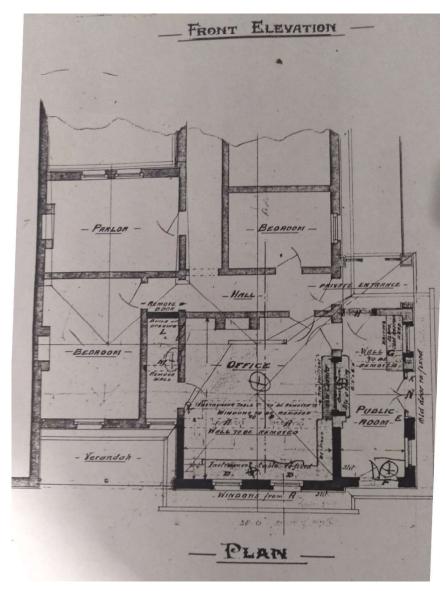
Plan dating to 1899, showing the proposed extension to the office space and public room, to form the two gabled-bays (Saleta 2016).
